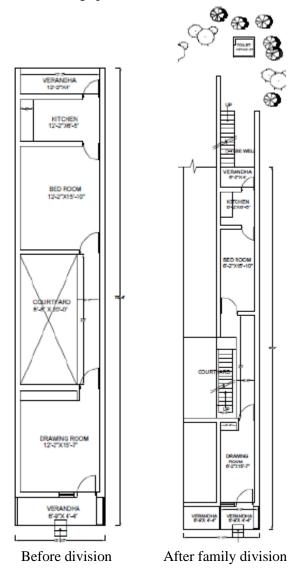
Plan of dwelling unit in Raghurajpur Source: Author
